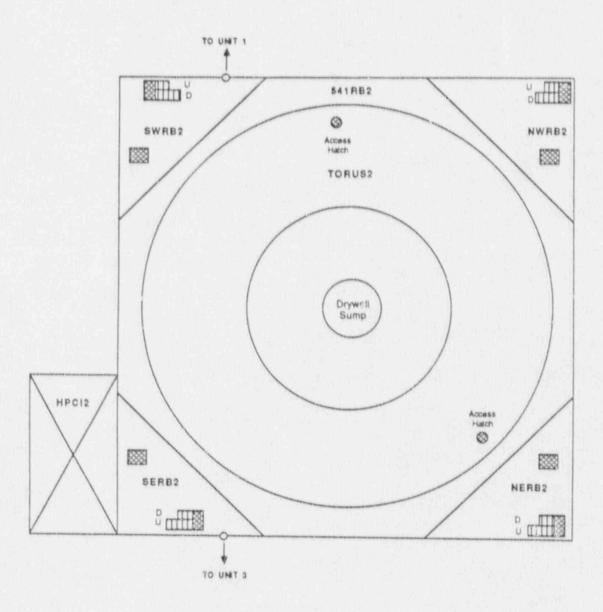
Browns Ferry Unit 2 Reactor Building - 541.5 ft. Elevation.
